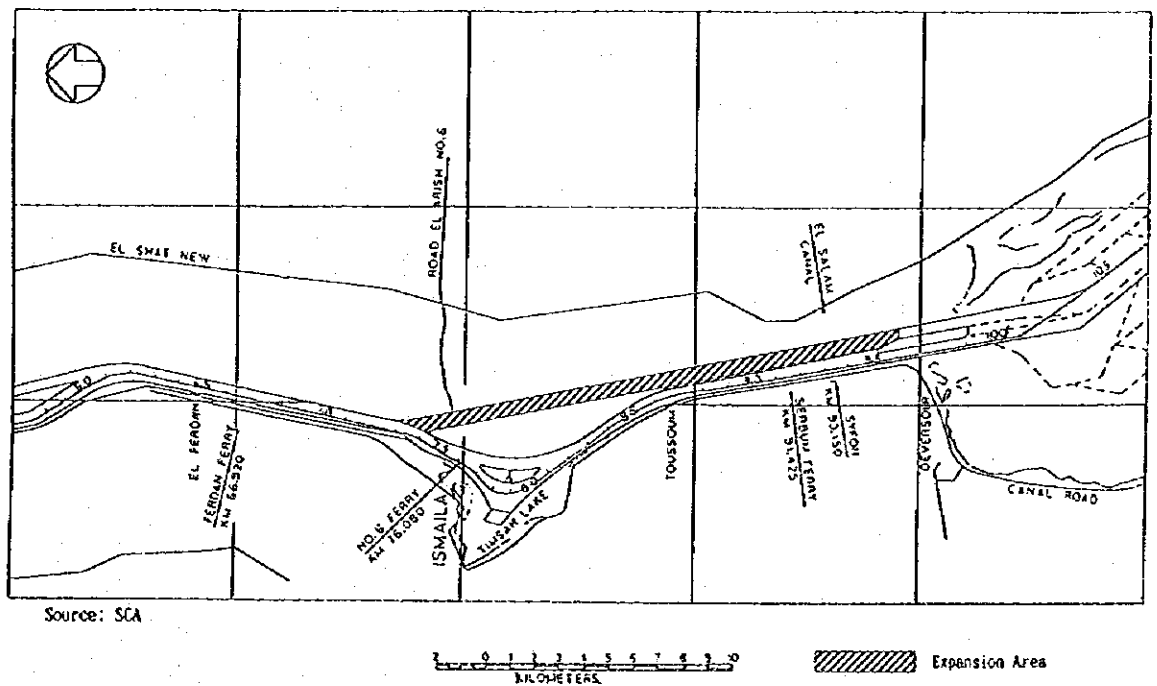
Extension Plan for Deversoir By-Pass
